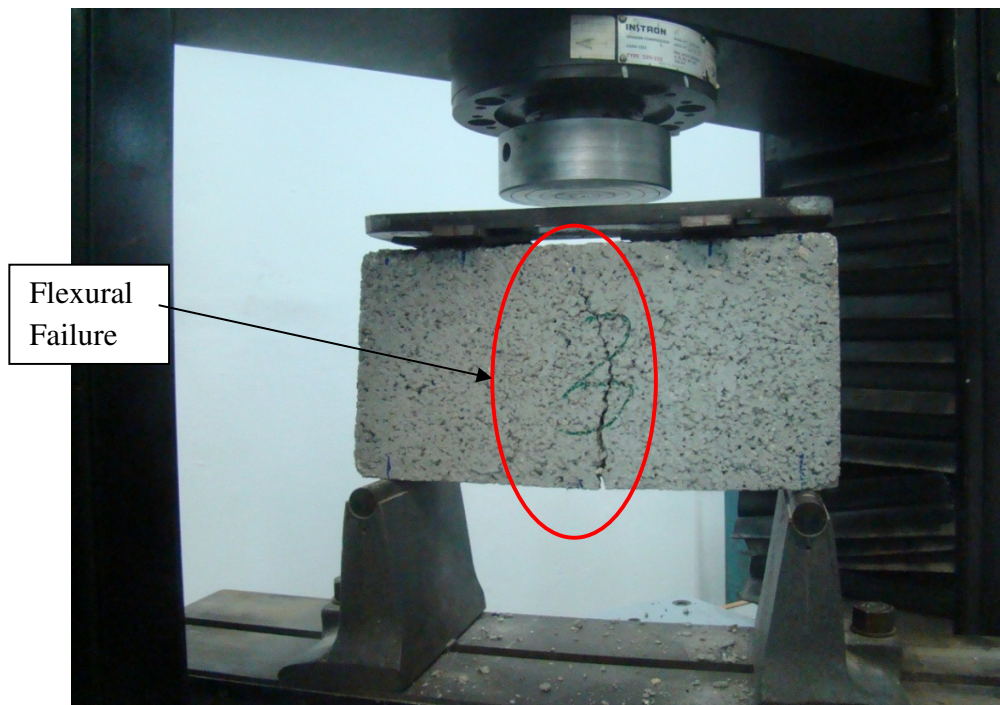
Flexural Test of Concrete Masonry Block (Specimen 3)
